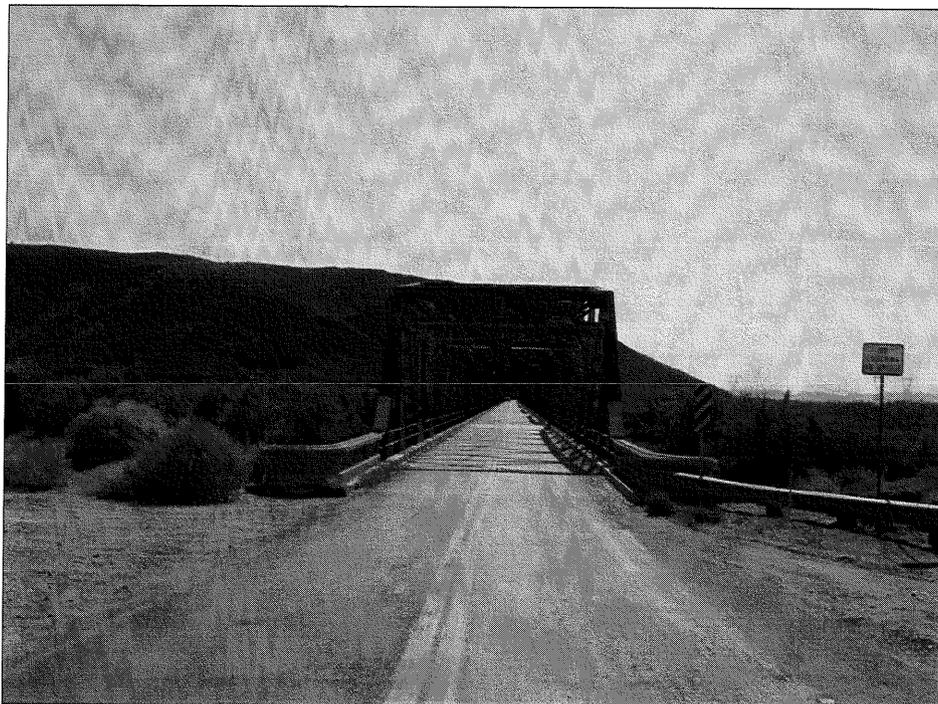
Photograph of Road Segment 3 (west side of river), AZ FF:9:17(ASM), facing east towards Gillespie Dam Bridge.
